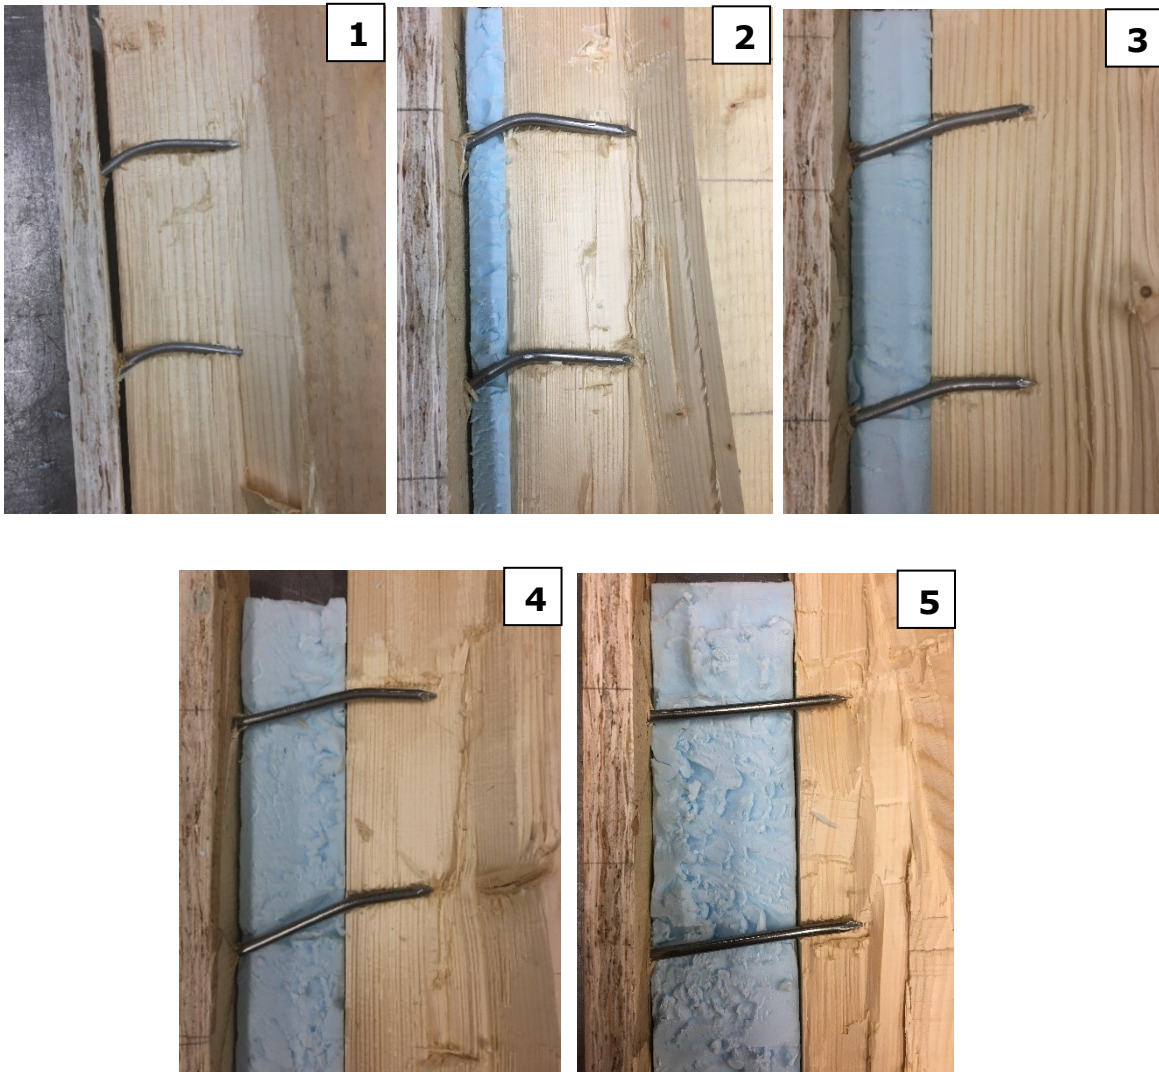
Typical failure mode of nail joints constructed with common wire nails (10d and 16d): 1 – 0 mm insulation; 2 – 12.7 mm insulation; 3 – 25.4 mm insulation; 4 – 38.1 mm insulation; 5 – 50.8 mm insulation
